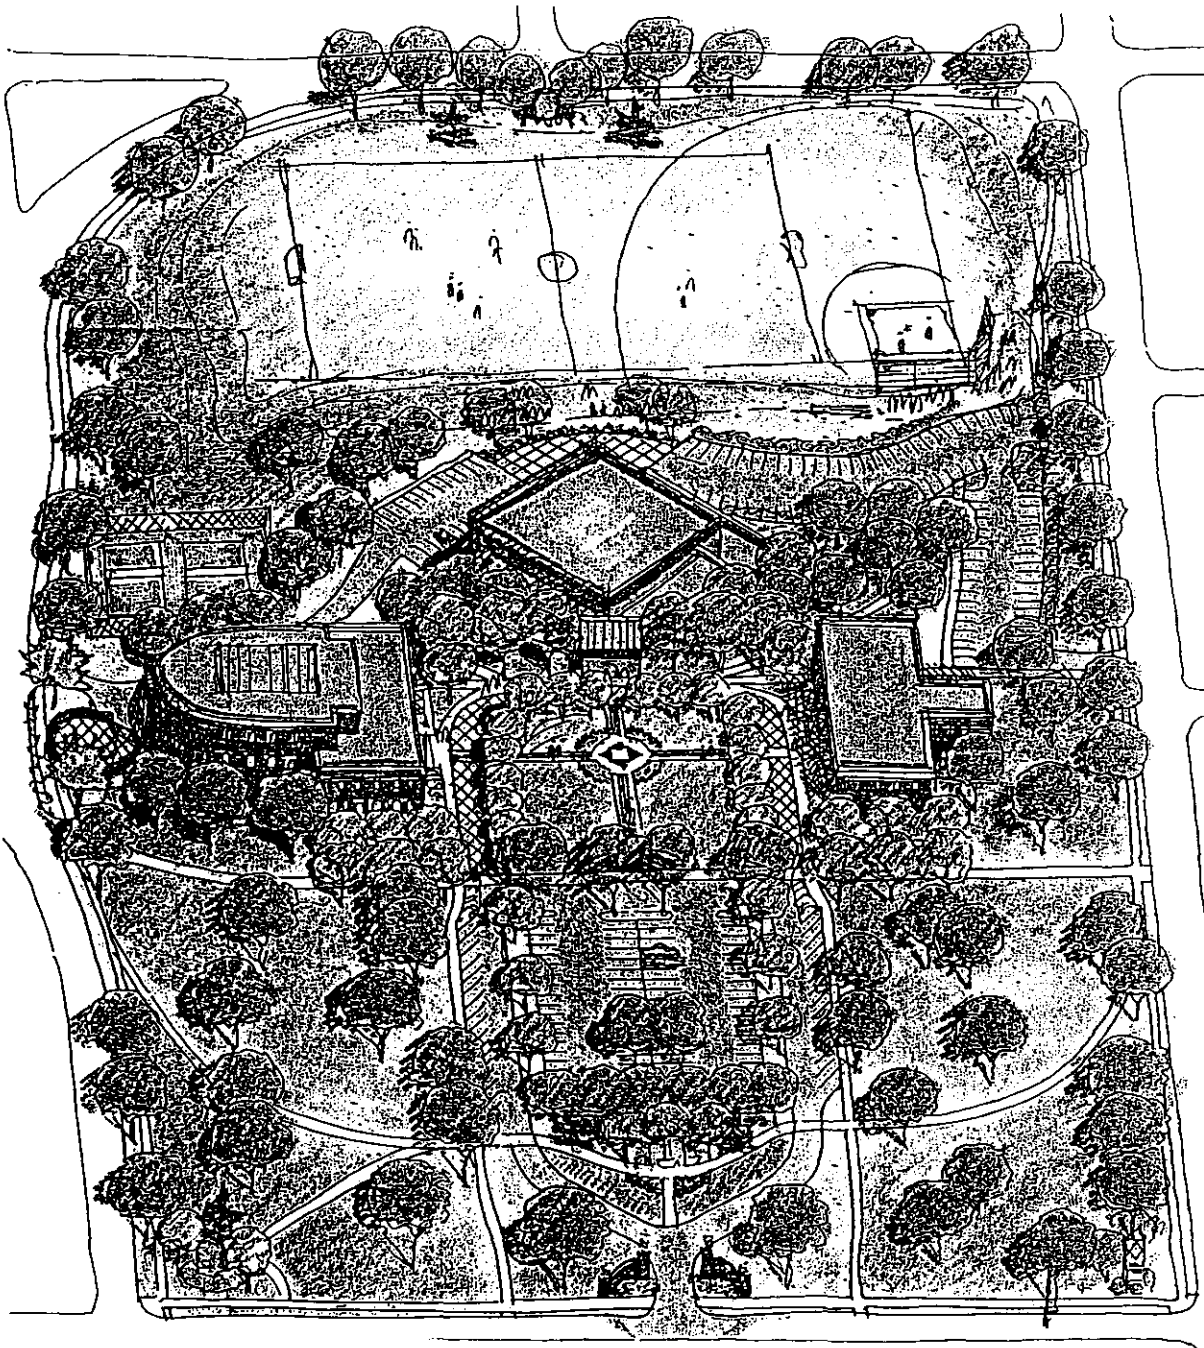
St. Teresa's Academy Site Plan (Mackey Mitchell Zahner Associates, Architects and Planners, 1998)
